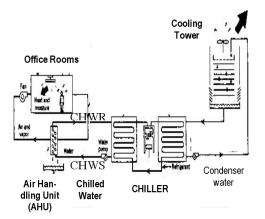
Central air conditioning system of the buildings (Stein et al., 1986).
